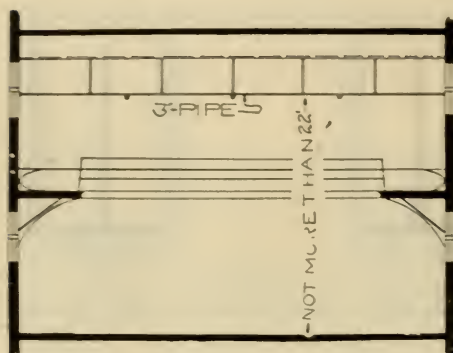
Standard Fittings and Methods recommended for attaching apparatus beams to concrete and enclosed girders.
